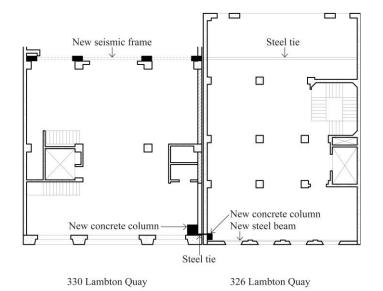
Simplified typical floor plans of 330 and 326 Lambton Quay, Wellington showing the main retrofit structure.
